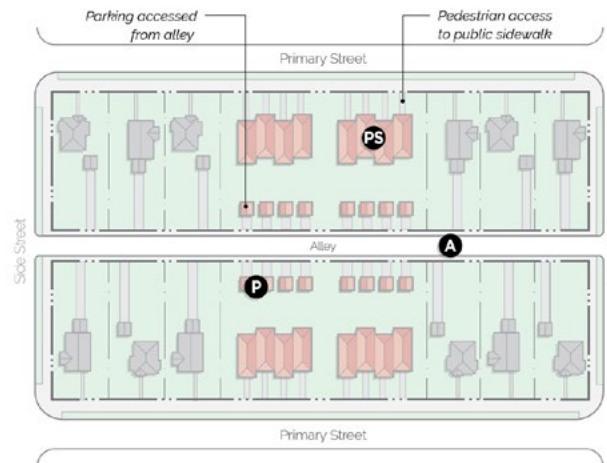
End of block versus mid-block townhouse parking standards (Prepared by Houseal Lavigne)
